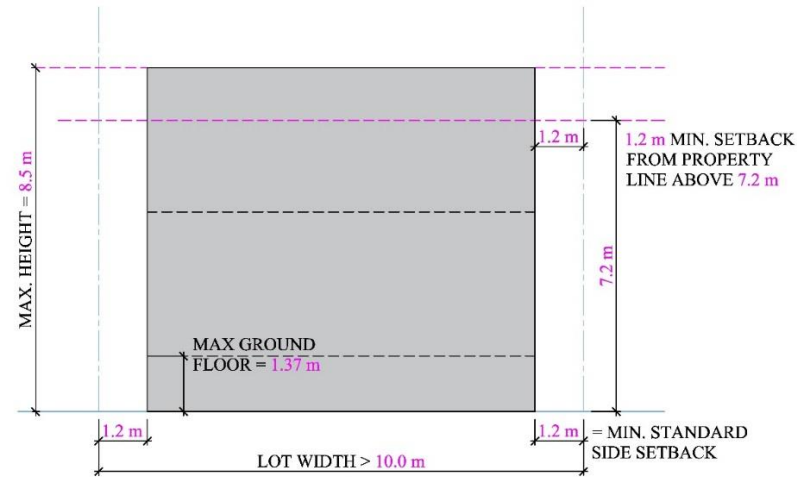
K.F4: Flat Roof Building with Side Yard Setback of 1.2 Metres
